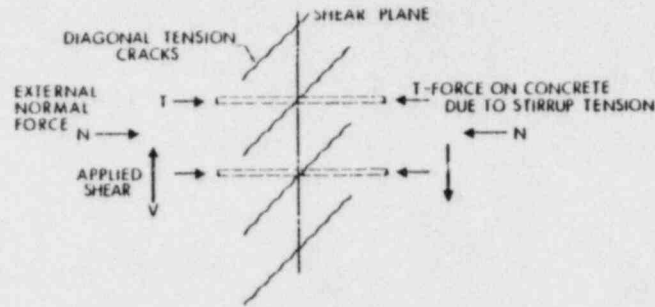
“Truss” Formed After Diagonal Tension Cracking (134)
